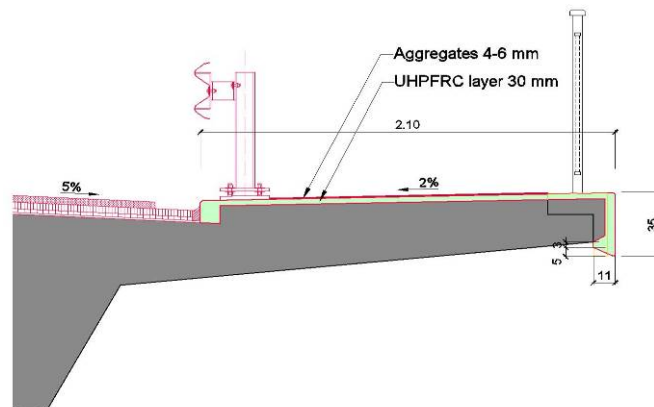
Detail of the sidewalk slab with the UHPFRC layer
